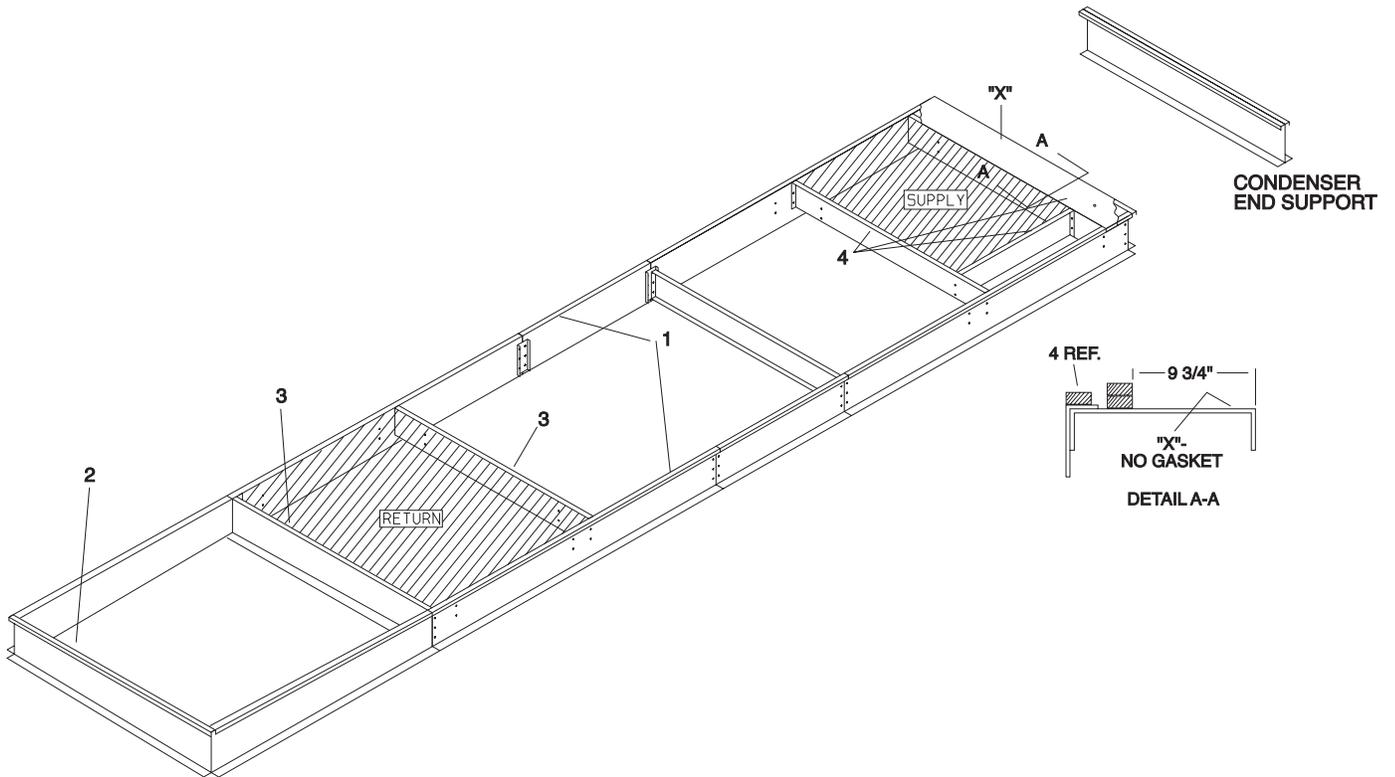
Gasket Location on Roof Curb (48ZT,ZW075-105 Units)
